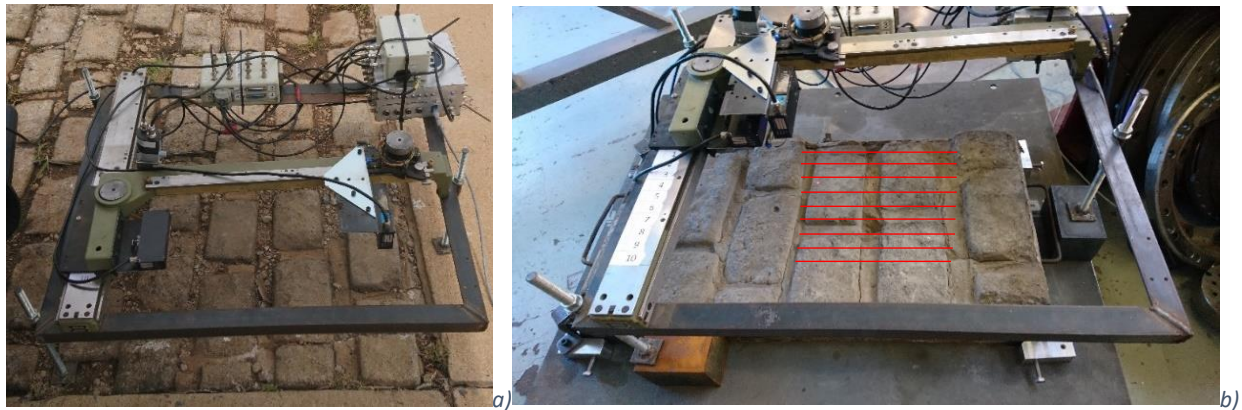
Macrop profiler measuring on a) Outdoor Belgian paving section b) Laboratory casting of Belgian Paving.
